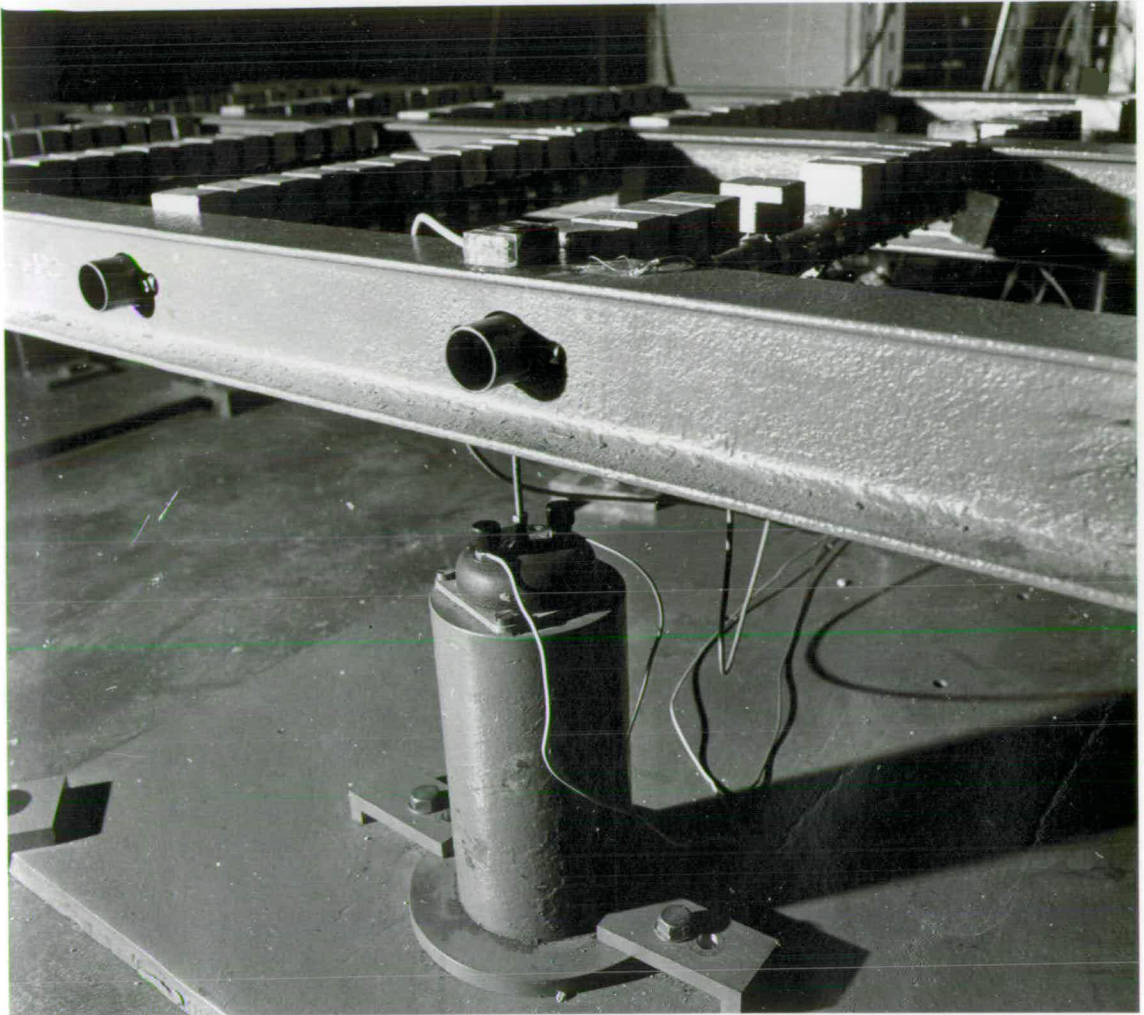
Detail of the model grid showing the pinned connection between the transverse tubes and the longitudinal girders. Also shown are an electro-mechanical vibrator, an accelerometer and a strain gauge attached to the flange of the longitudinal girder.
